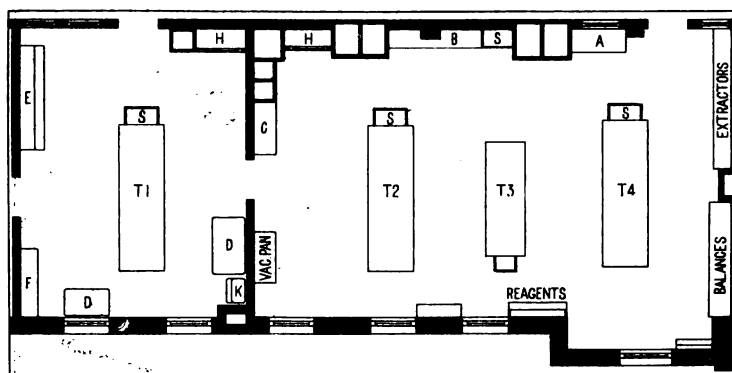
Plan of station laboratories on second floor. T1-T4 laboratory tables, S sinks, A, B, C, & F work tables, D desk, K filing cabinet, H hoods, E glass-case for chemical apparatus.
